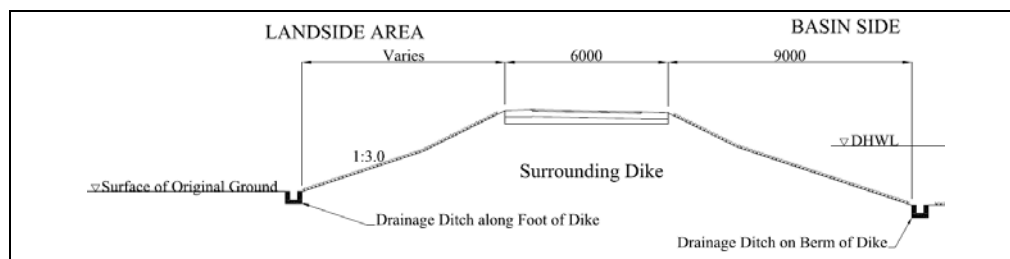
Drainage Ditches along Surrounding Dike
